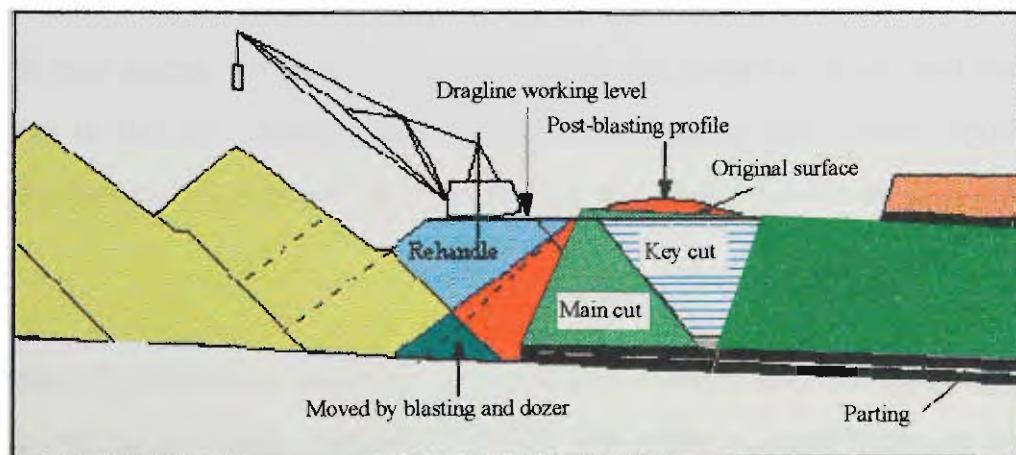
General view of a standard Extended Bench method combined with a thrown blasting technique.
